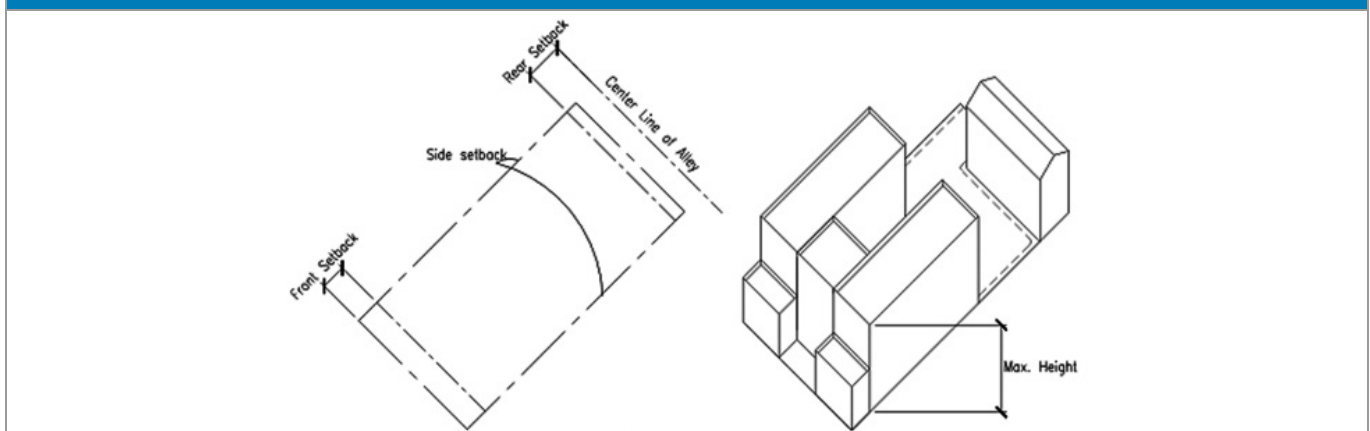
C : ILLUSTRATION OF TOWNHOUSE BUILDING FACADE
